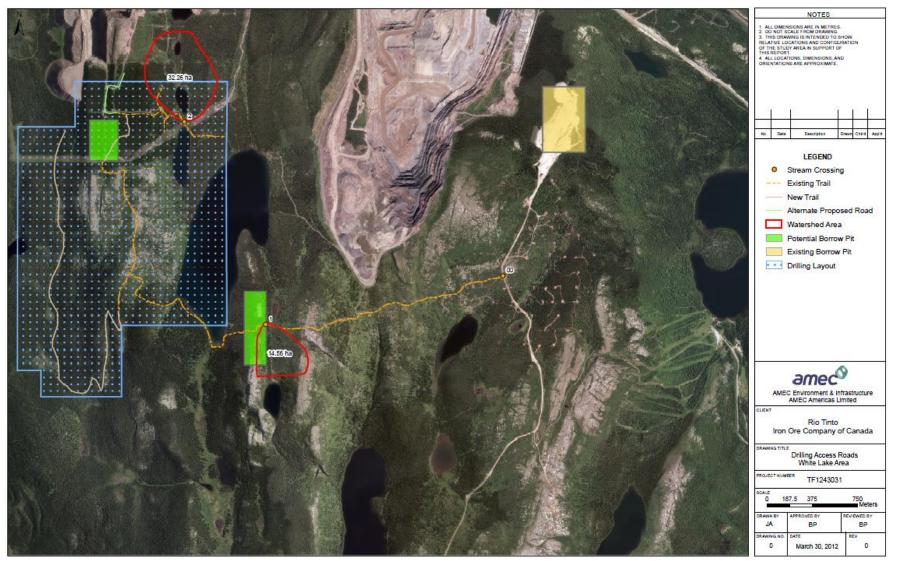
Proposed Drilling Access Roads for the White Lake Area.
